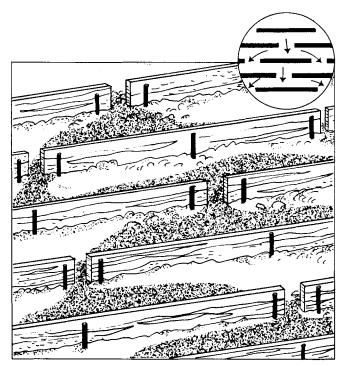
Pretreated or redwood boards help stablilize the face of soil slips.
